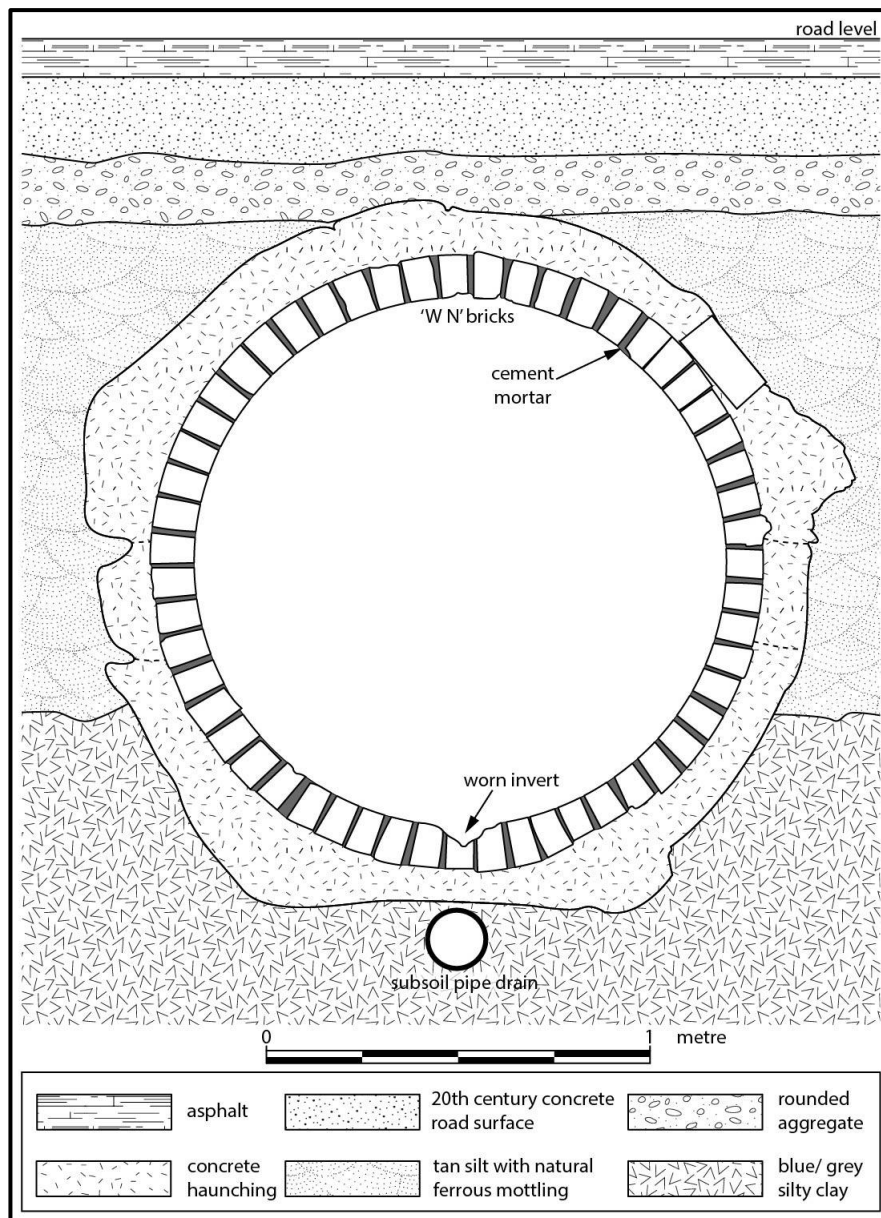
Stratigraphic detail of the Ferry Road stormwater brick barrel as recorded at the eastern end of the segment repair 6 works area.
